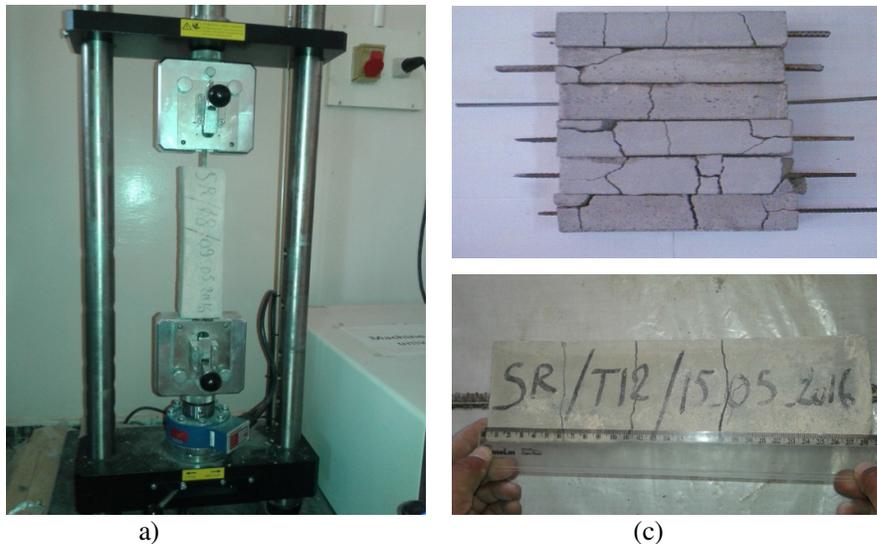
(a) Universal testing machine device assembly of test pieces after test (b) network of cracks. (c) measurement of crack spacing)
